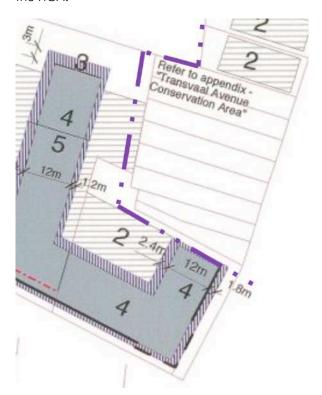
ControL Summary for the northern side of Cross Street. Note the limited setback to the Transvaal Avenue buildings. Note the proximity of the developed area to the Transvaal Avenue shops.
